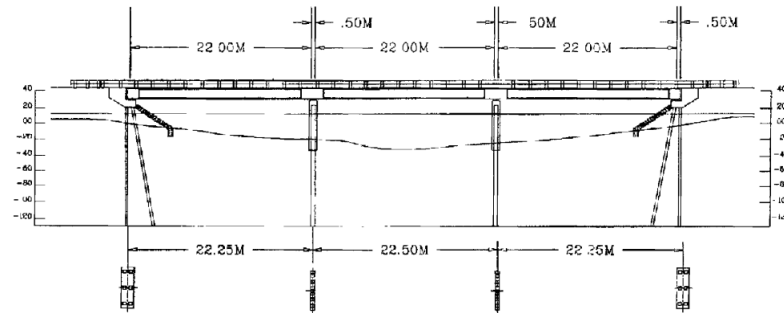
Rio Vizcaya bridge: Built drawing (after Priestly et al. [5])
